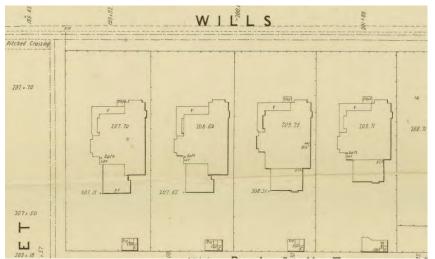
Footprints of the houses at 19-25 Wills Street in 1905. Note that the four have virtually identical plans (apart from the size of the rear wing), suggesting they are the work of a single designer/builder. (Source: MMBW Detail Plan No. 1335)
